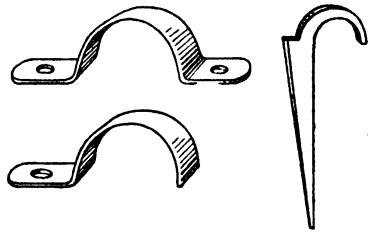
Types of saddle which are employed for clipping conduit to woodwork and pipe hook for attaching to walls or plaster.
